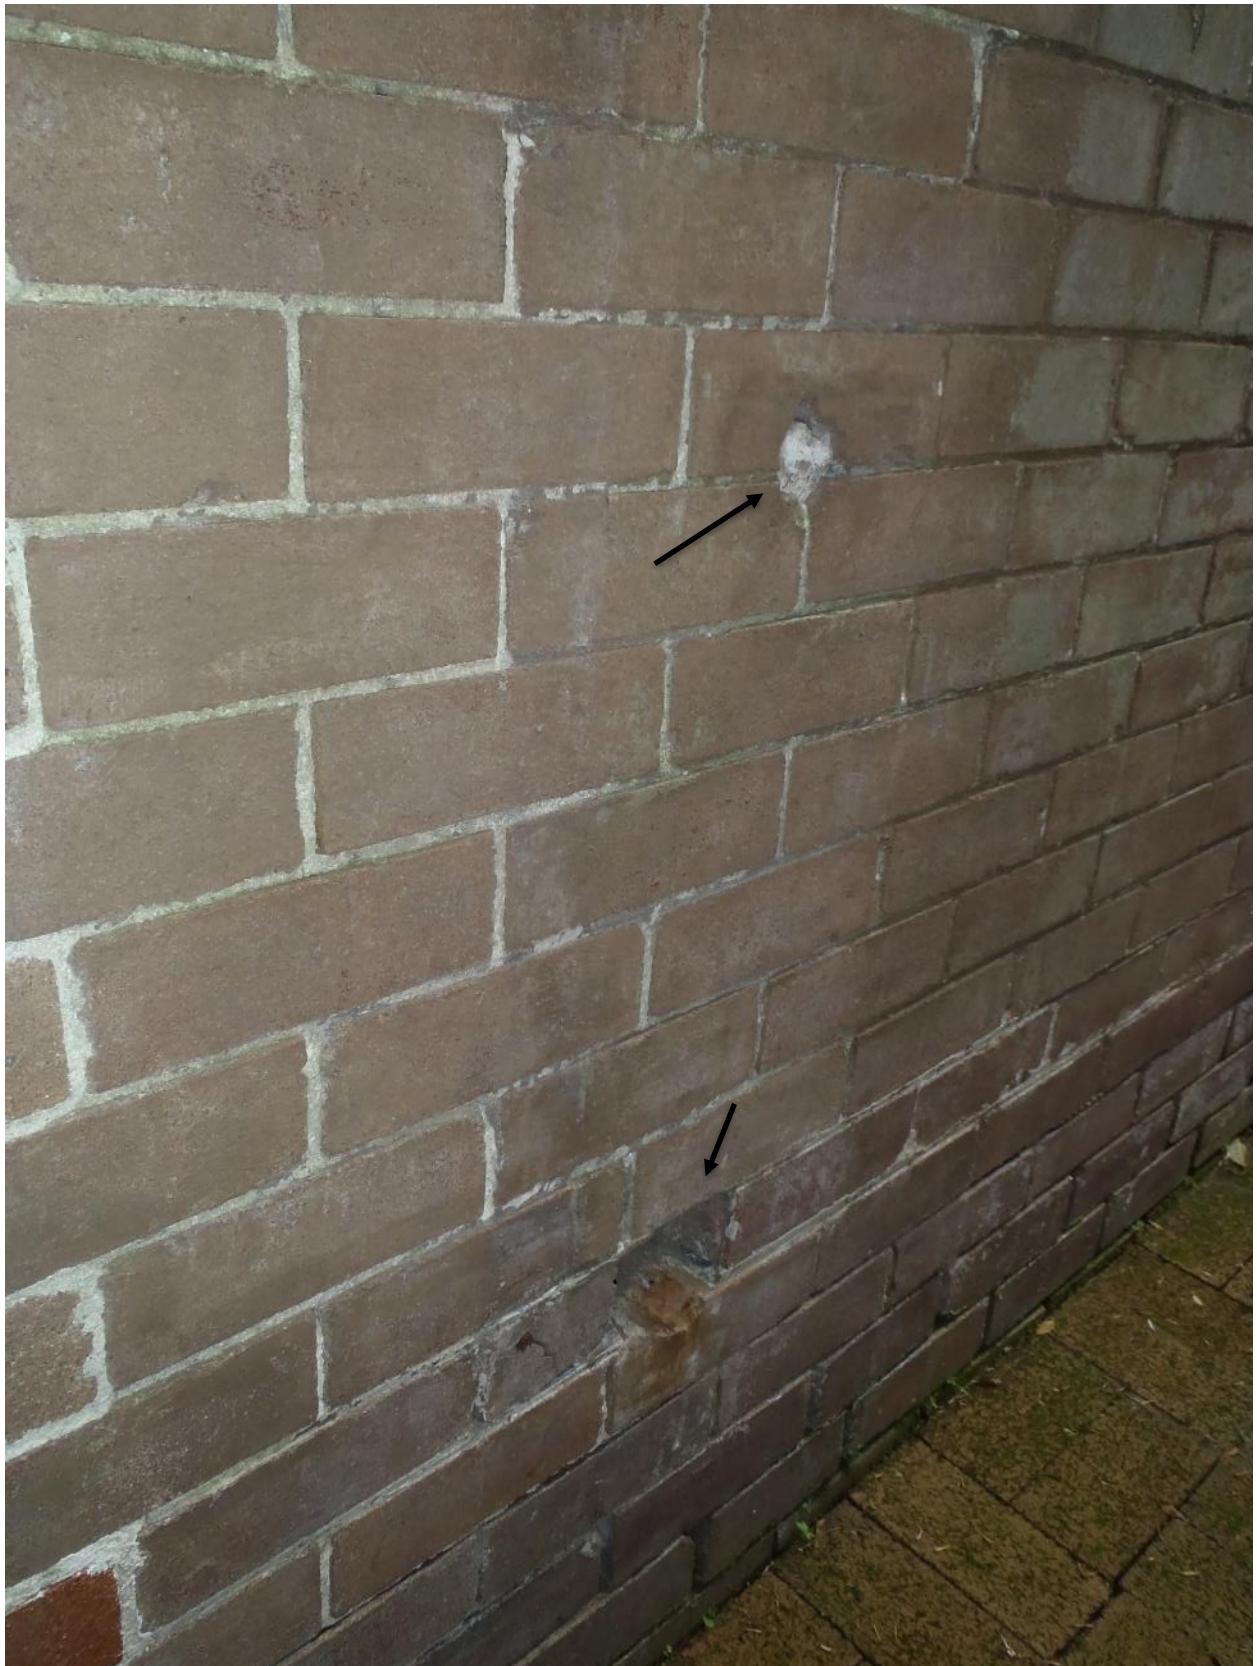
shows deterioration of the surface coating on the southern elevation brickwork.
